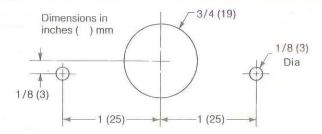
Bulb Mounting Hole Arrangement for Drilling Ductwork
